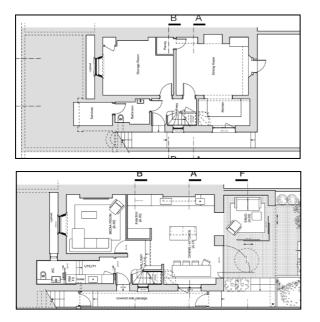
Existing and proposed basement floor plan at no.14 Provost Road showing the floor plan changes and widened opening through to the rear addition.
